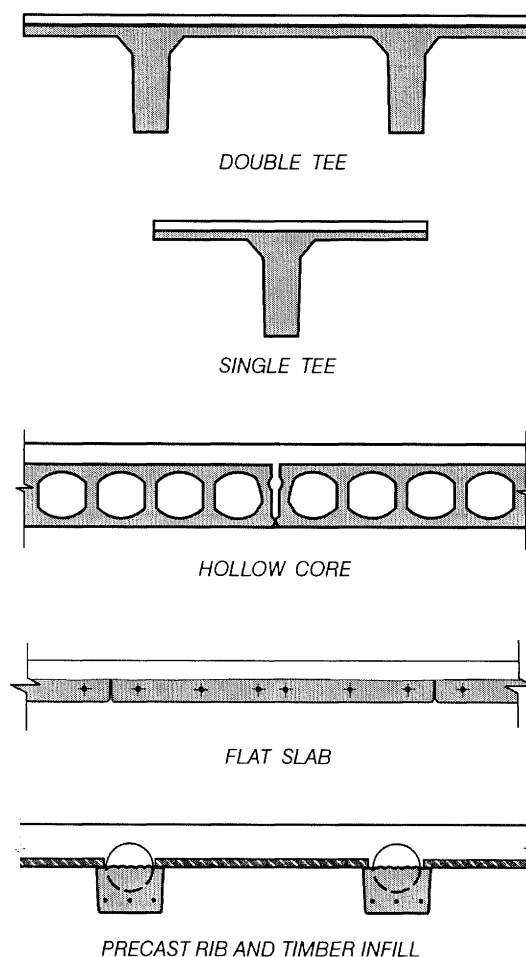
Typical pretensioned, precast concrete floor units with cast-in-place topping.
